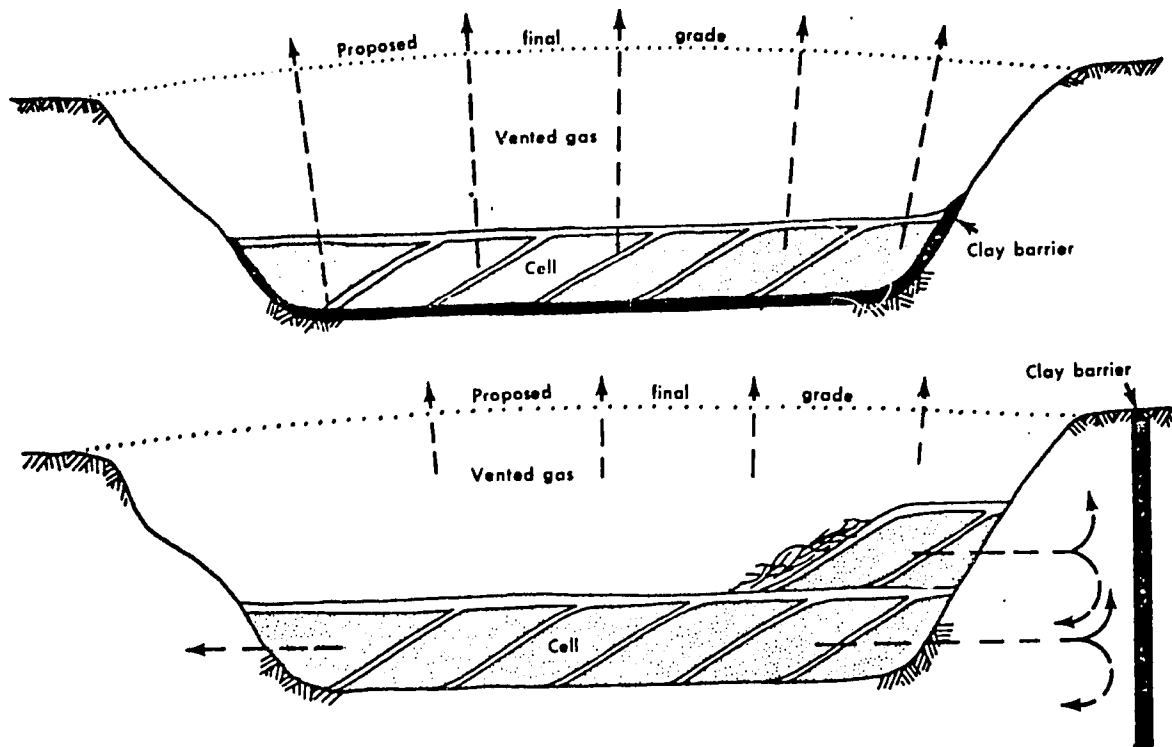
Clay can be placed as a liner in an excavation or installed as a curtain wall to block underground gas flow.
